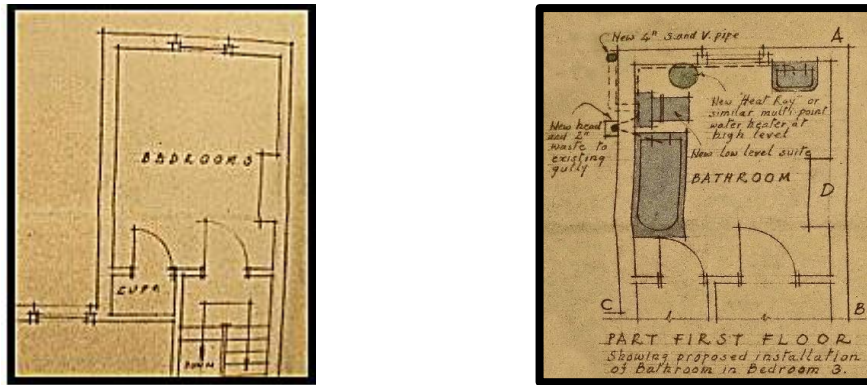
proposed alteration at No. 22 for conversion of exterior WC into interior bathroom (Building Plan No. 17769) (CA)
